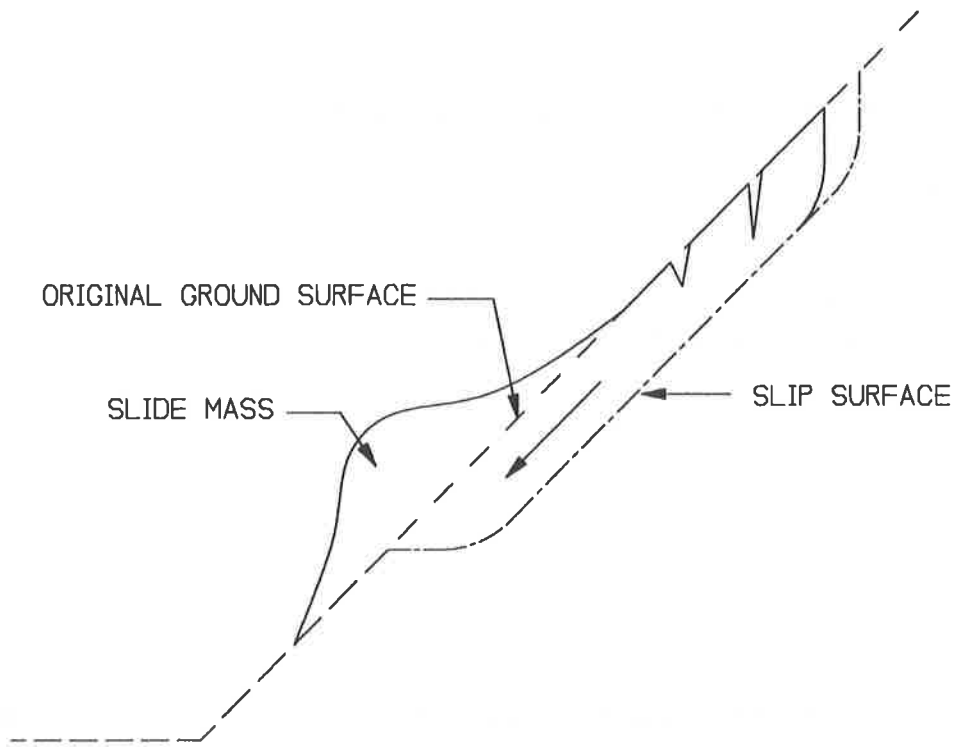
TYPICAL SURFICIAL SLOPE FAILURE
